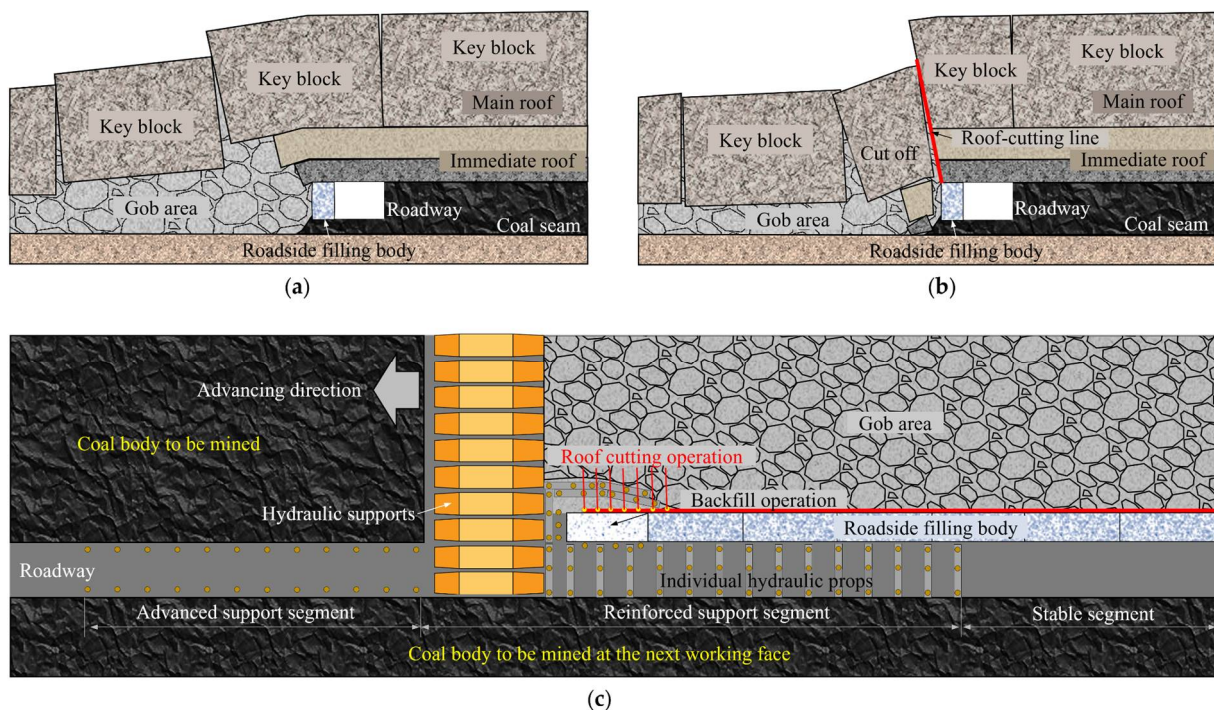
Delayed pre-splitting and cutting roof for gob-side entry retaining. (a) Gob-side entry retaining with backfill (b) Cutting roof on goaf side (c) Working methods of roof-cutting and gob-side entry retaining with backfill.
